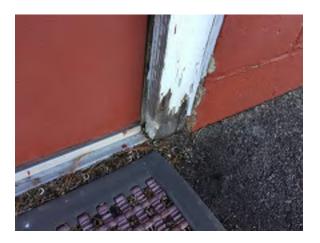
Exterior doors in poor condition. Wood jamb is worn where it meets the asphalt. Replace jambs. (Priority 0).
